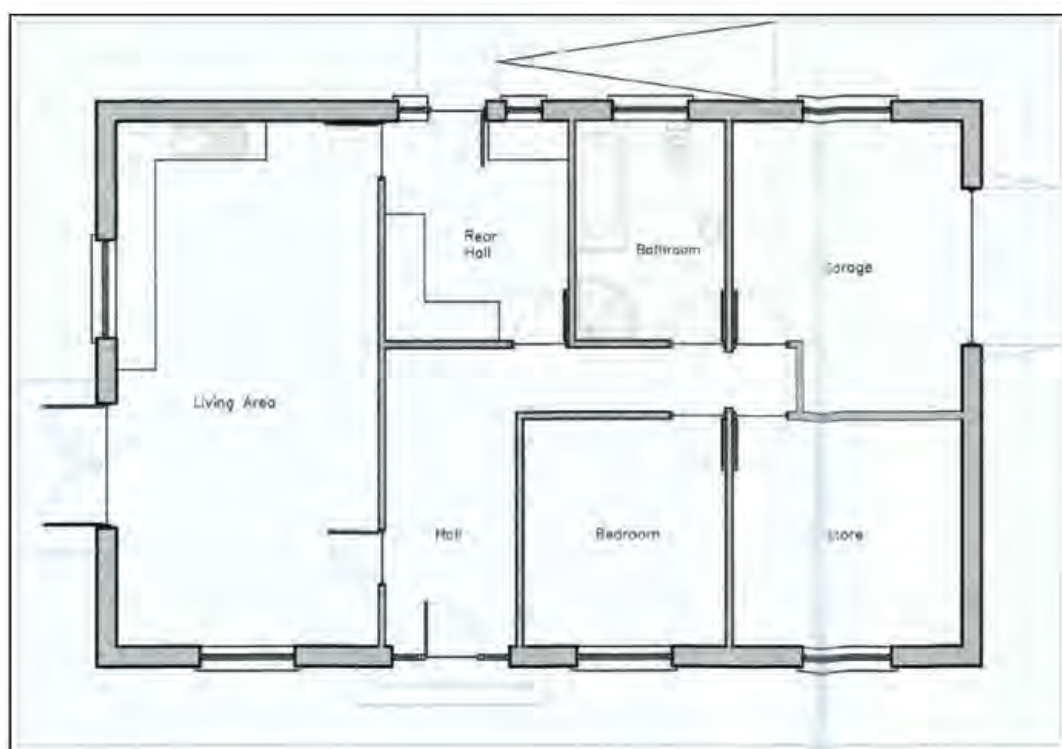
Proposed Revised Floor Plan Received on 30th March 2017
